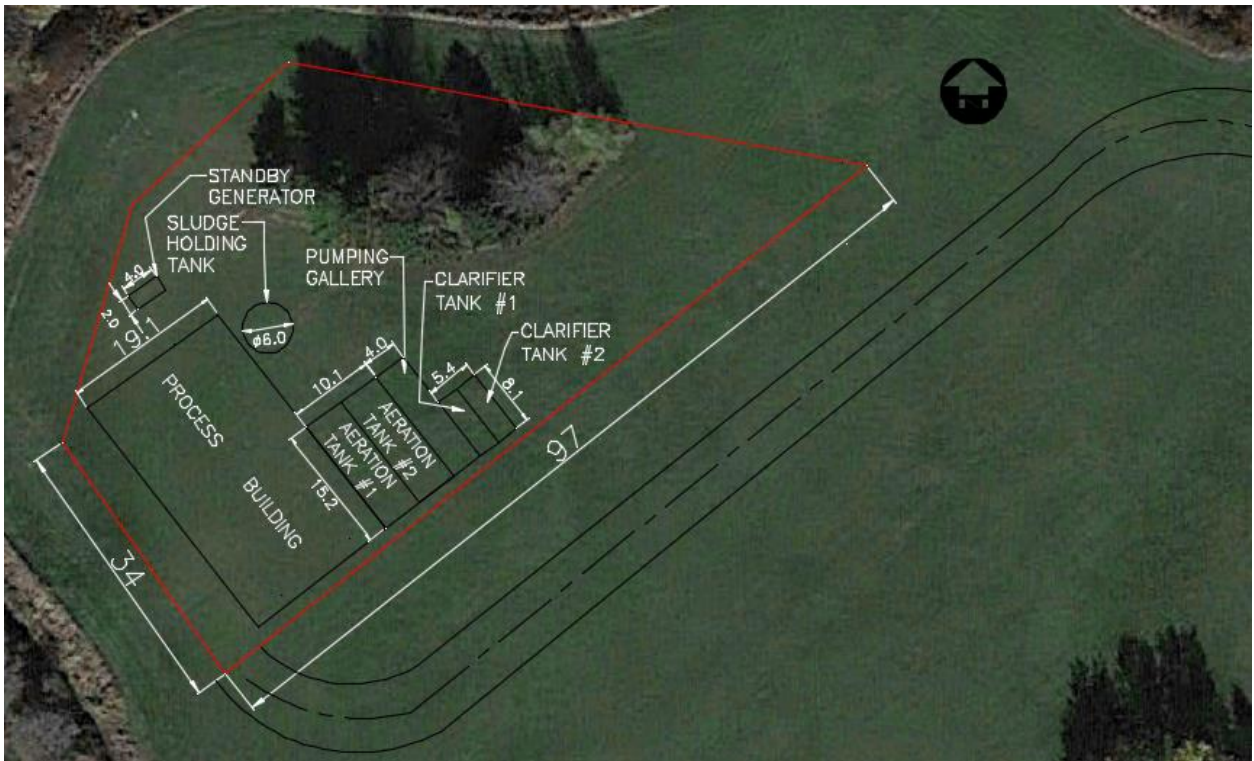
Fingal Location – Extended Aeration Facility Detail
